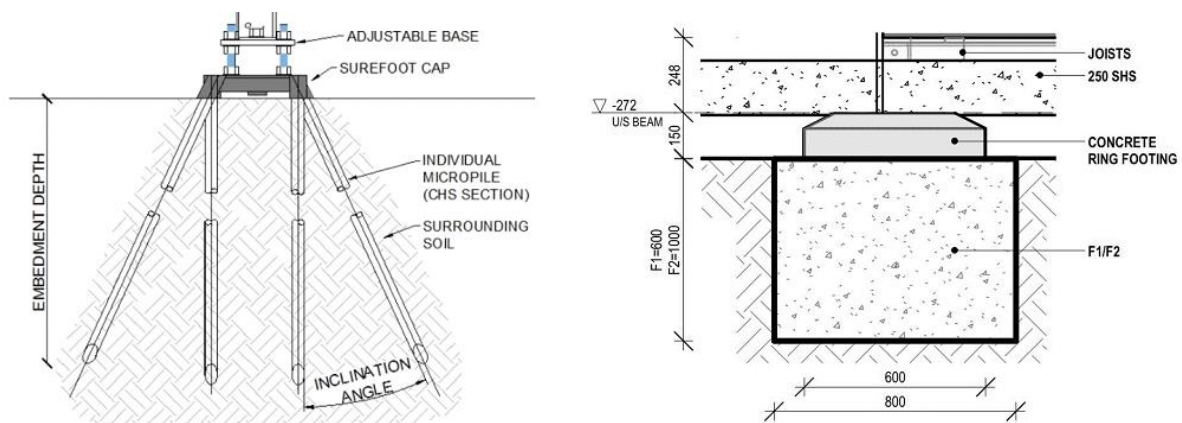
(a) Concrete free micro pile system used as the foundation of L3 (Mehdizadeh, Disfani et al. 2017) (b) Traditional footing design, mass concrete footing with a concrete ring.
